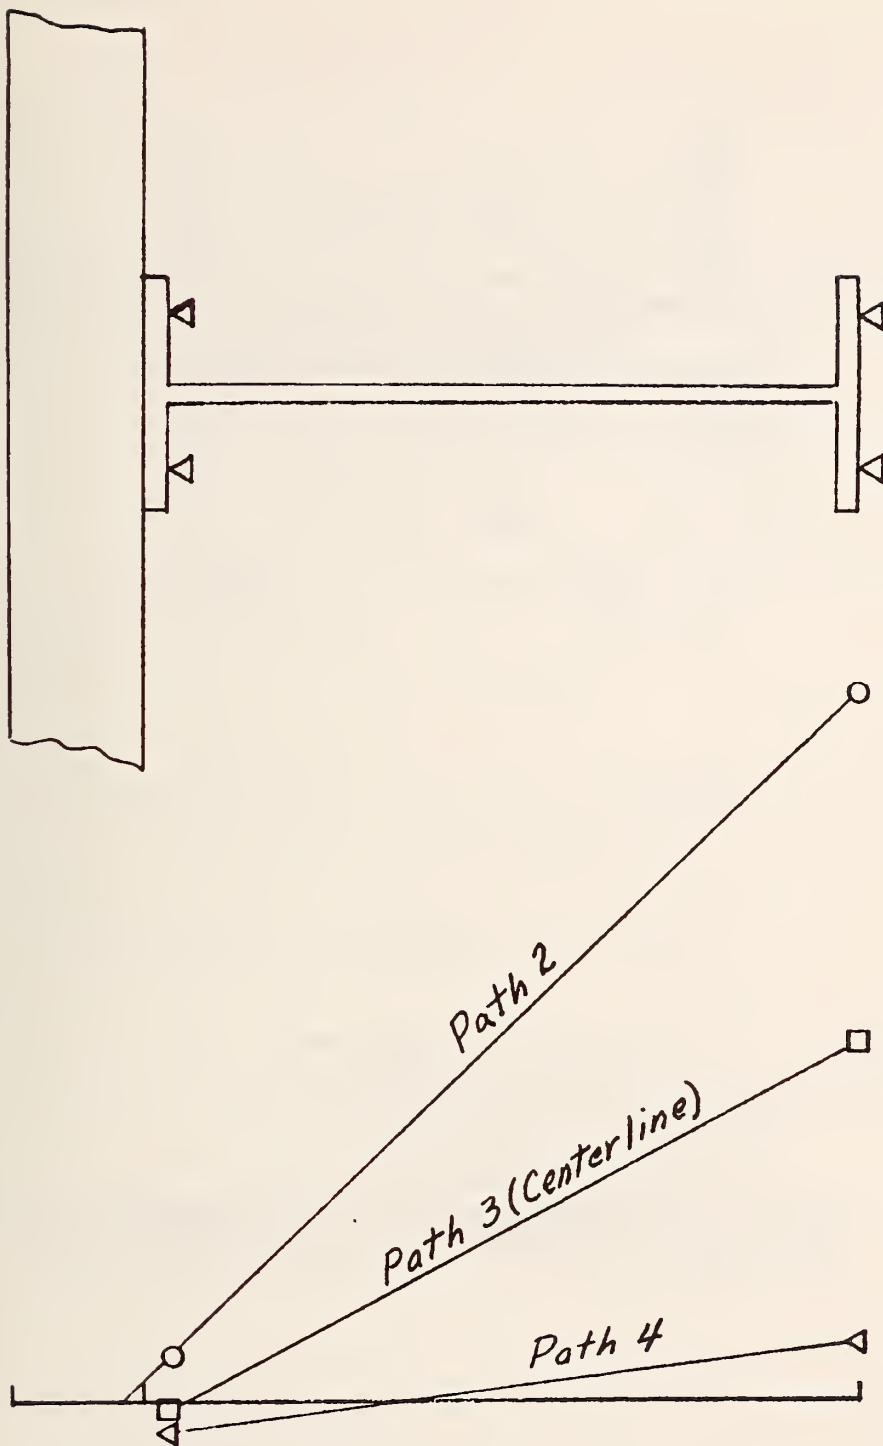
NEUTRAL AXIS LOCATION FROM MEASURED STRAINS WITH HET-70 LOADING, EXTERIOR GIRDER NEAR MID-SPAN OF 90' SPAN, FOUR SPAN CONTINUOUS STEEL GIRDER BRIDGE.
